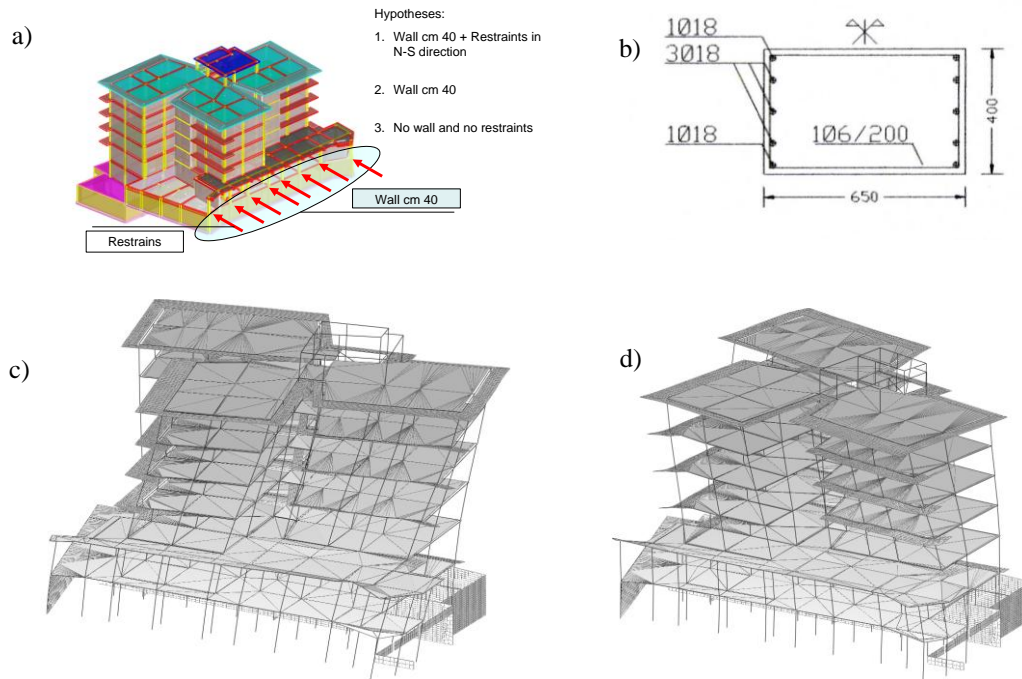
a) Geometric model of the building; b) typical column detailing at ground floor; c), d) modal shapes for 1st and 2nd mode, respectively.
